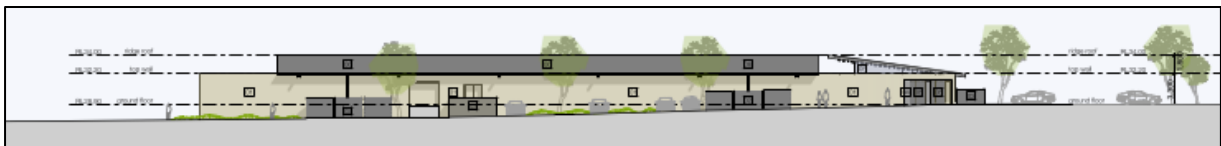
Southern elevation of the main chocolaterie building. Source: Application documents.
